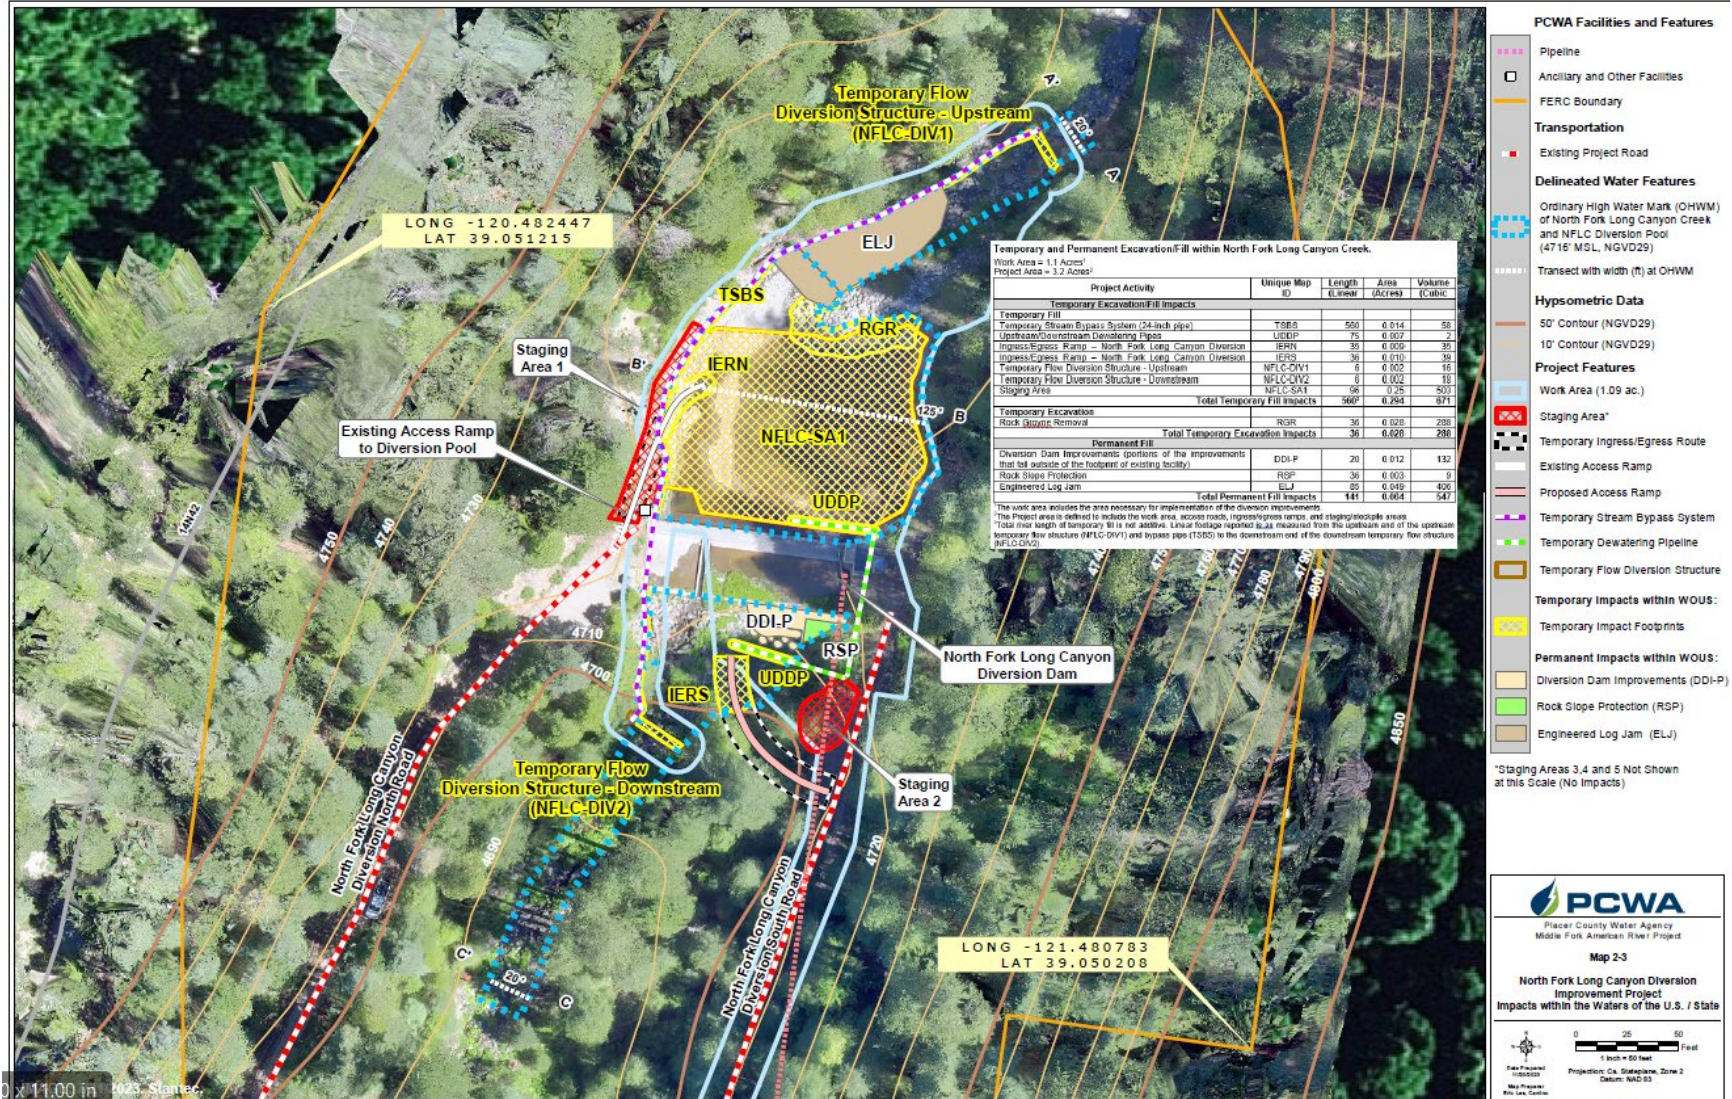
Aerial View of North Fork Long Canyon Diversion Improvement Project Work Area (PCWA 2023)
